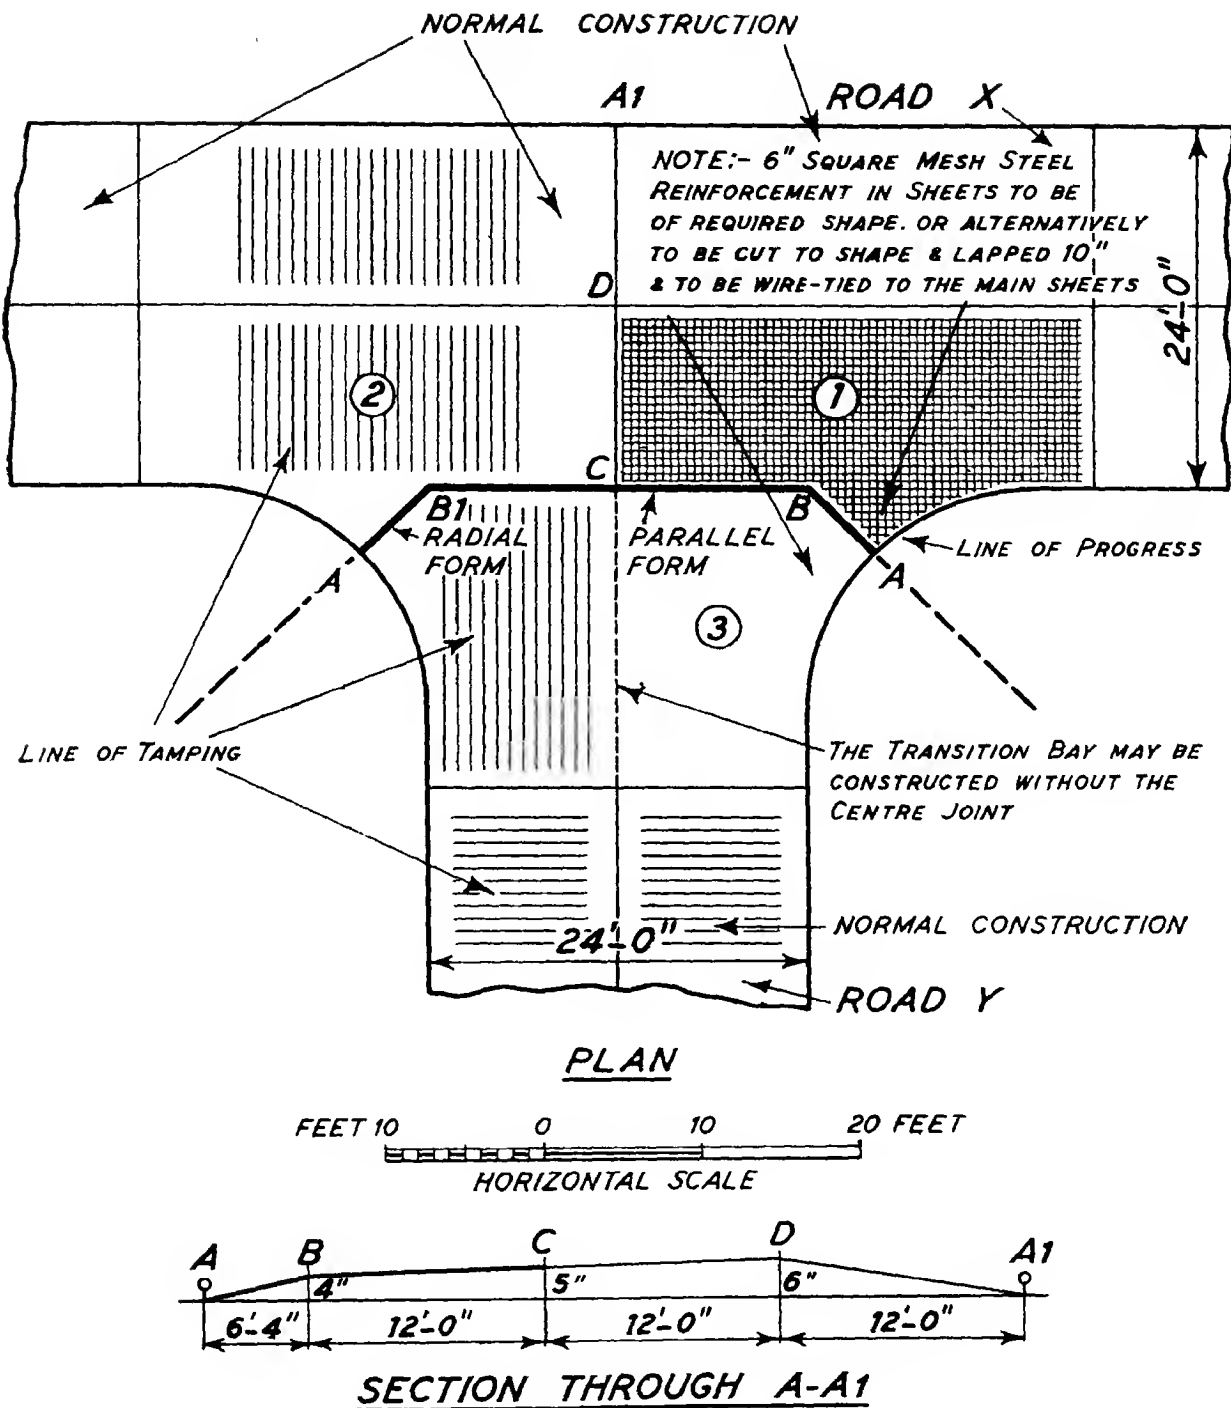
TYPICAL INTERSECTION OF CONCRETE CARRIAGEWAYS, SHOWING THE USE OF RADIAL AND PARALLEL FORMS
